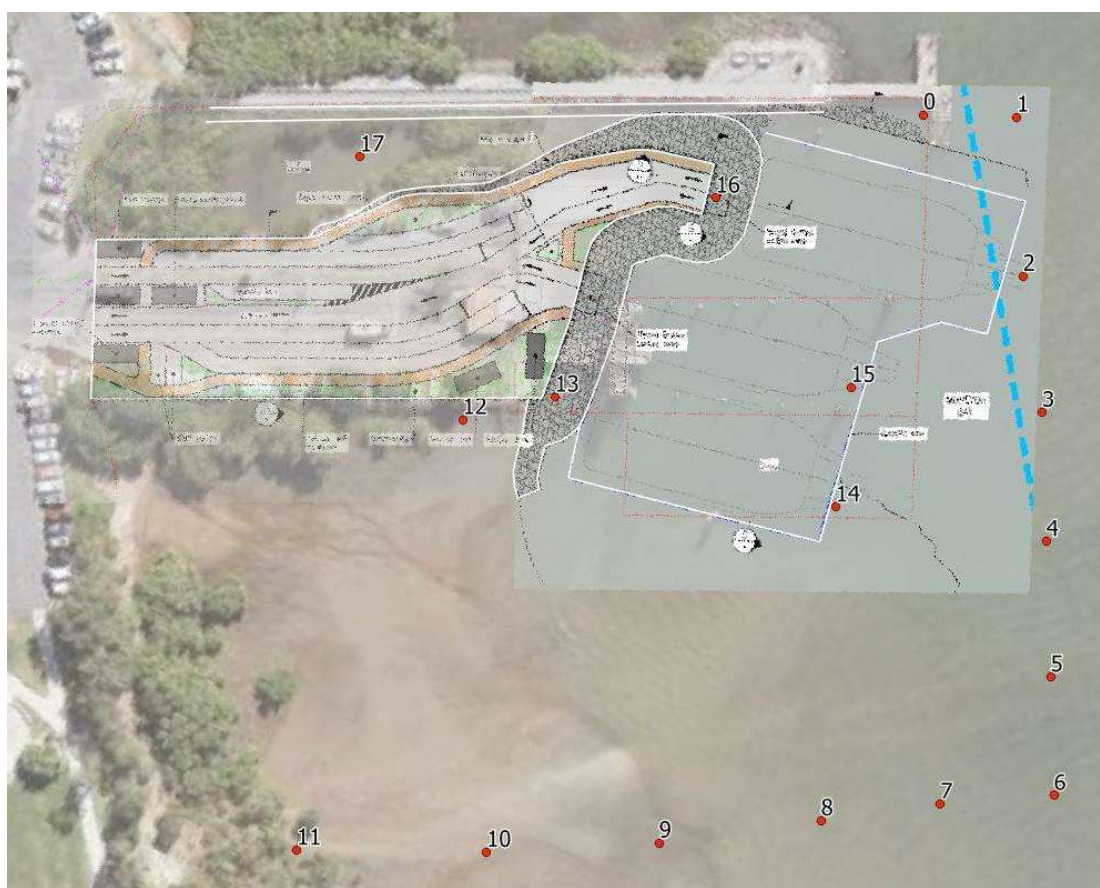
Proposed ferry terminal layout plan view showing Delft3D model recording points for Spring-Neap period (Projex Partners).
